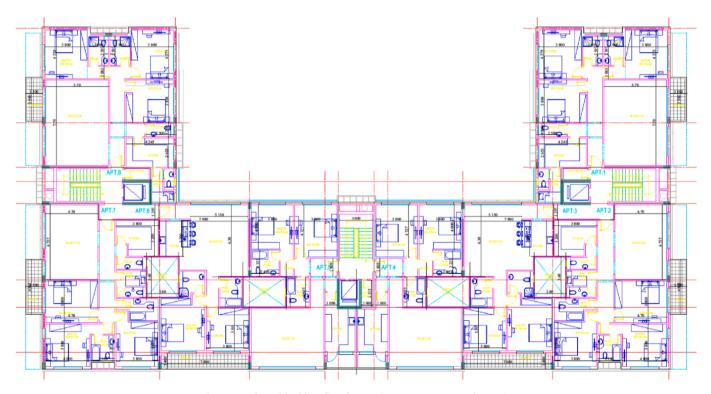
Residential building floor layout. (Image: Francesco Reda, VTT).
